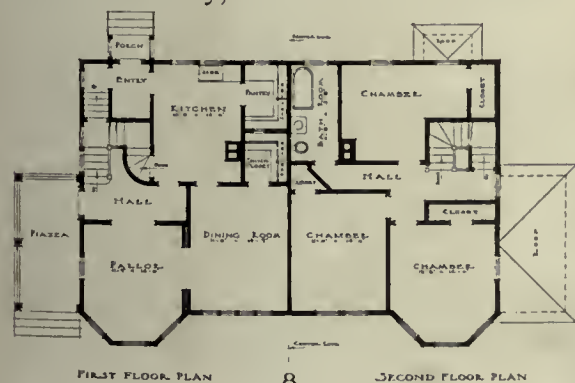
Floor Plans, House No. 8, Lakeside Group
